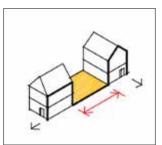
Side gable elevations opposing rear elevations require a minimum back-to-side distance of 11 metres
